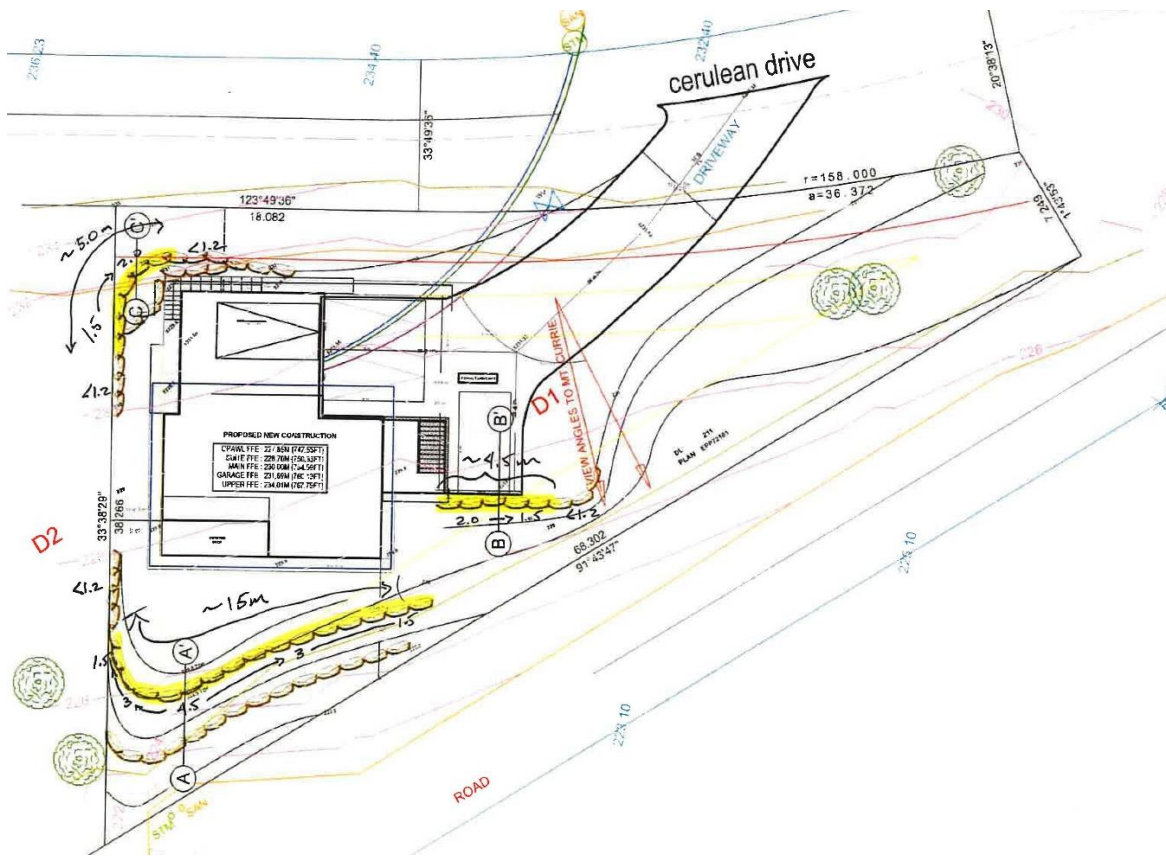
Site Plan –indicating the tapering heights of each retaining wall section
